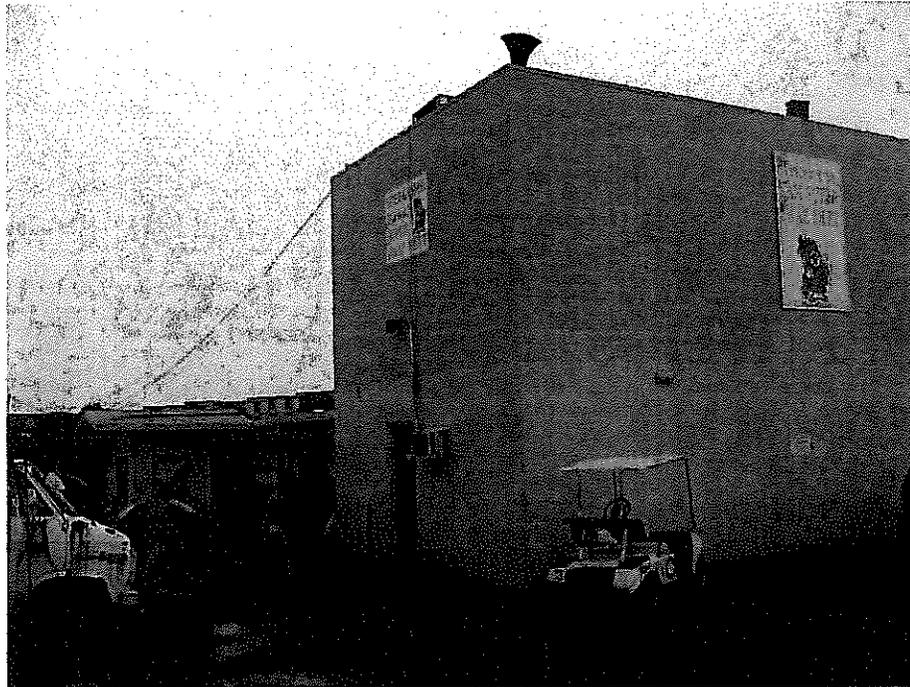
General view of central snack bar and projection building infrastructure to southwest
